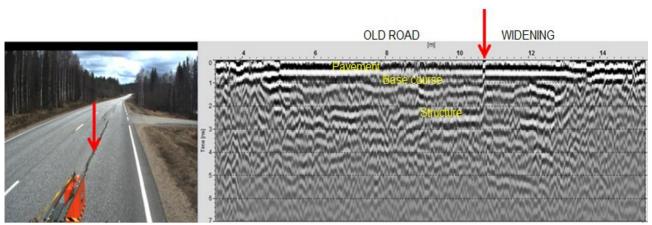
An example case from Finland showing a discontinuity and thickness difference between the existing road and new widening structure. Private access road drainage problems might have also partly triggered the distress process.
